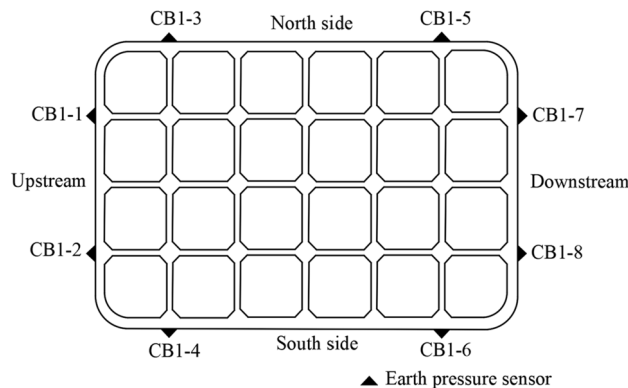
Plane layout diagram of earth pressure sensor in sidewall.
